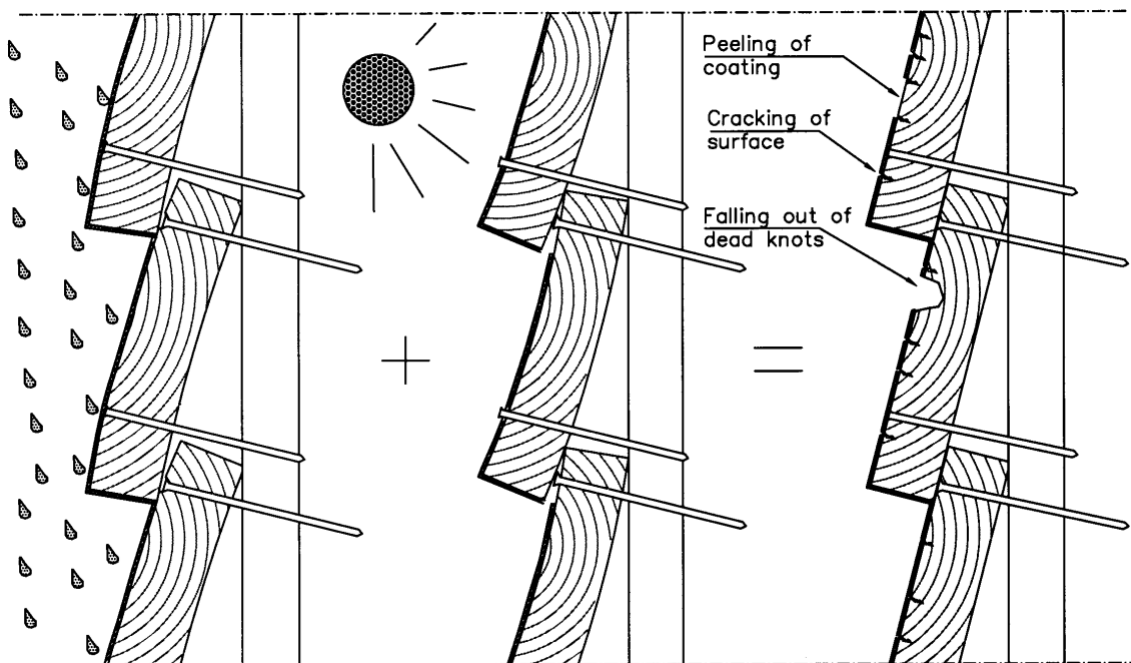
Typical damage to wooden claddings due to weathering.
